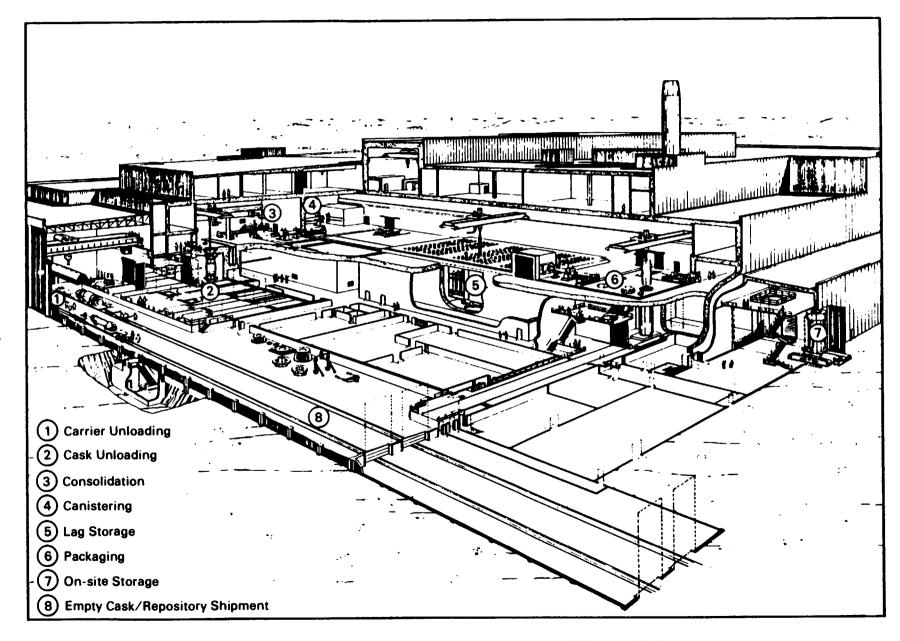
Overview of the MRS Receiving and Handling Building
